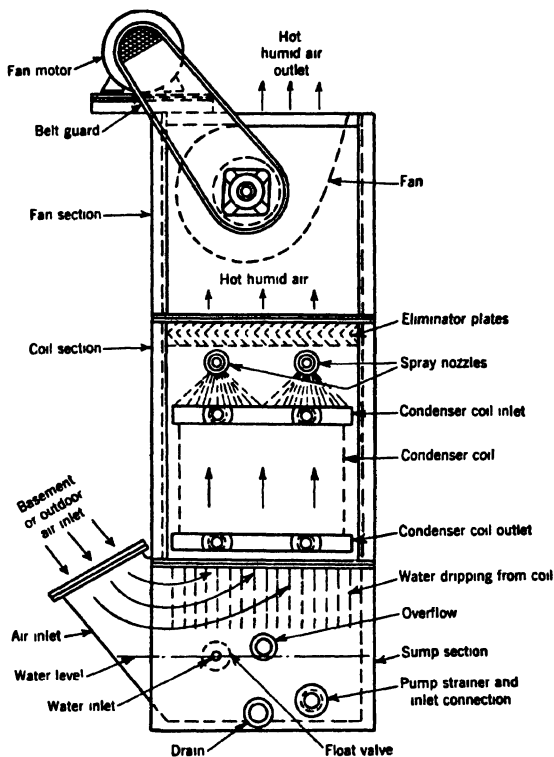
SCHEMATIC VIEW OF AN EVAPORATIVE CONDENSER
